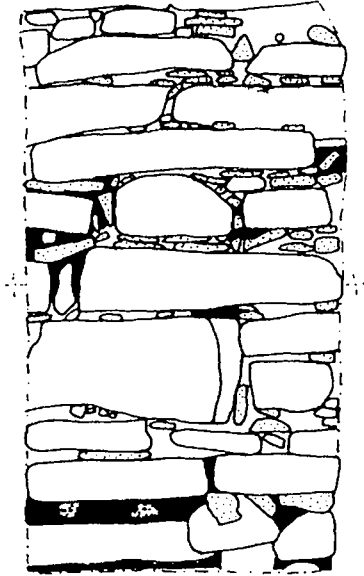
Exterior south-west elevation of Trelill Holy Well (by Jo Sturgess)
